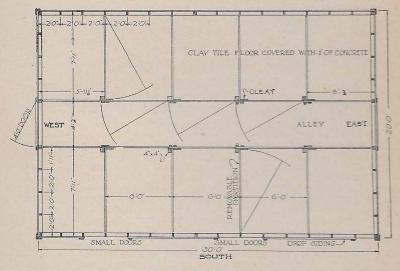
Floor plan of hog house No. 10.72-53, shown in figure 6.
